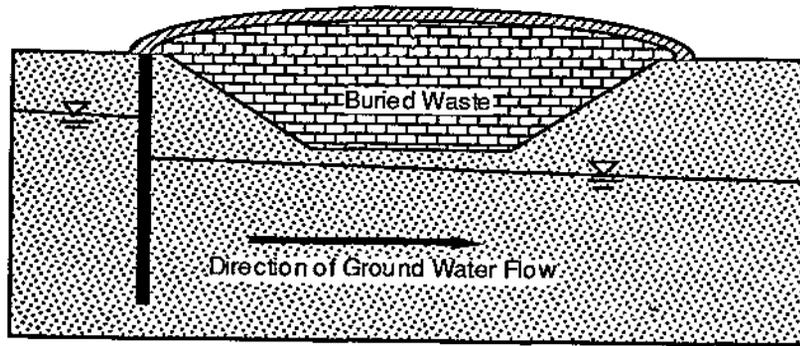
Example of Vertical Cutoff Wall to Limit Flow of Ground Water through Buried Waste.
